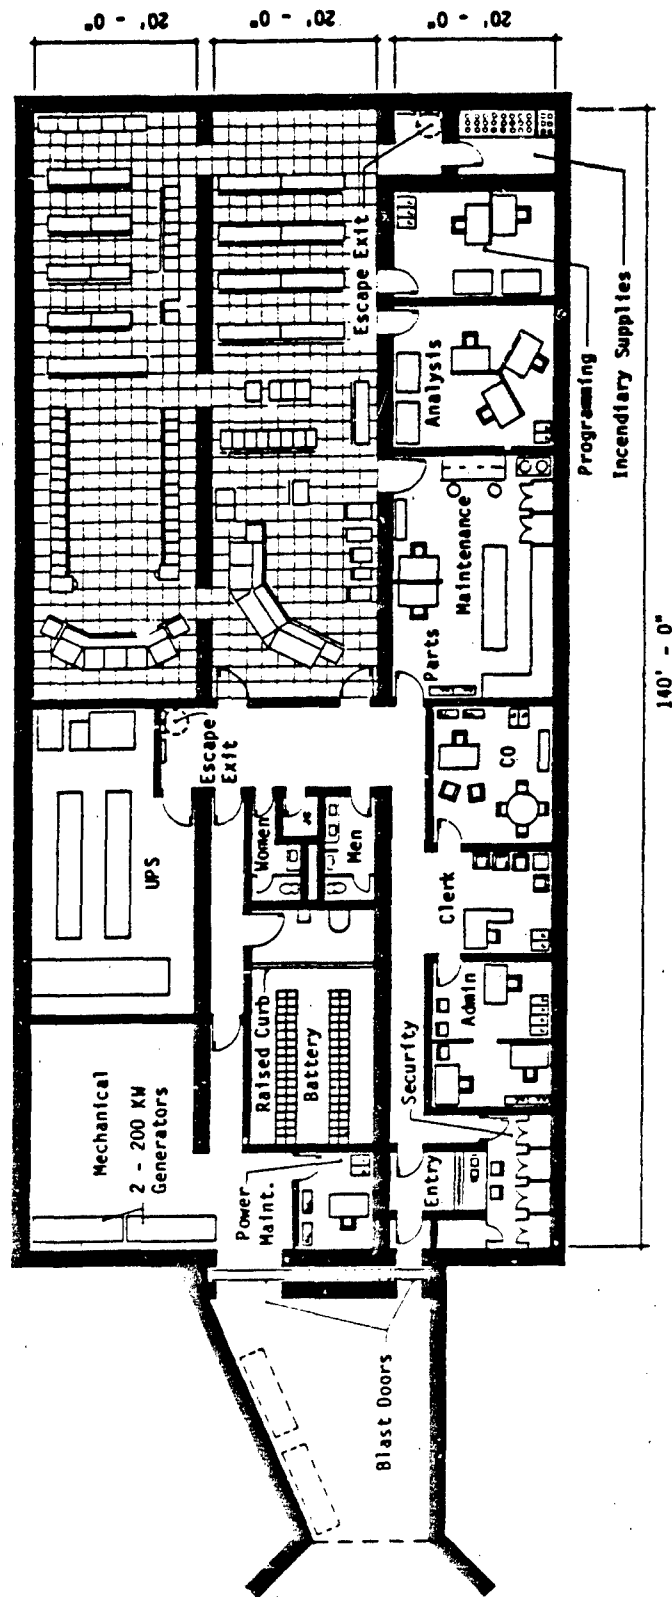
AUTODIN SWITCH FACILITY PLAN--RECTANGULAR CONFIGURATION.
